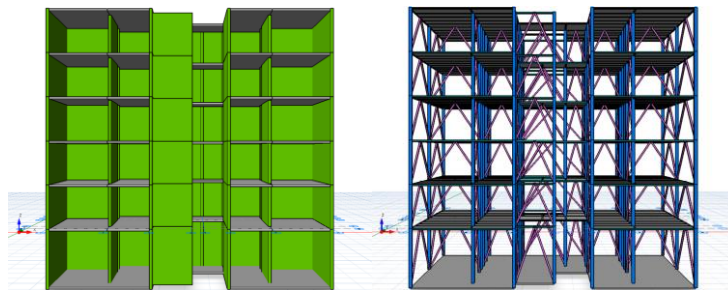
5-Story Reinforced Concrete Model (left) and 5-Story Steel Model (right)
